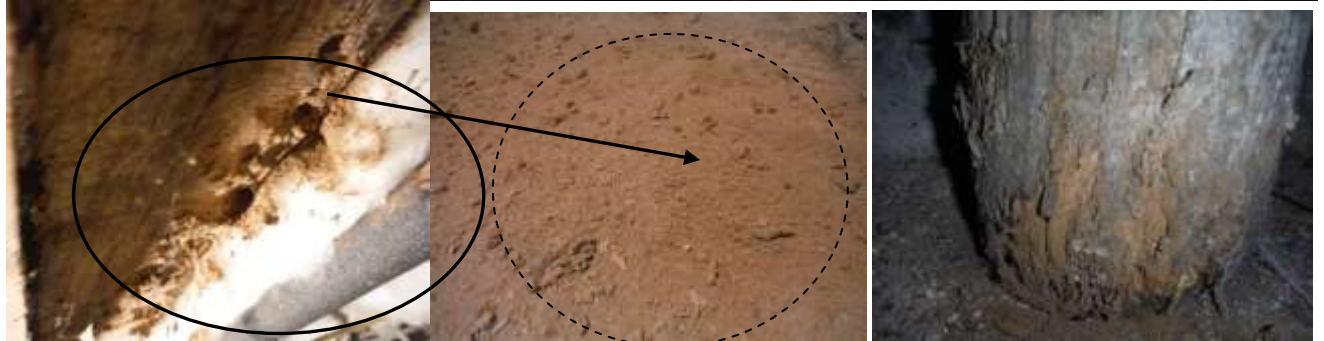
Examples of damaged heavy timber and debris or damaged wood fallen onto floor when heavy timber probed.
